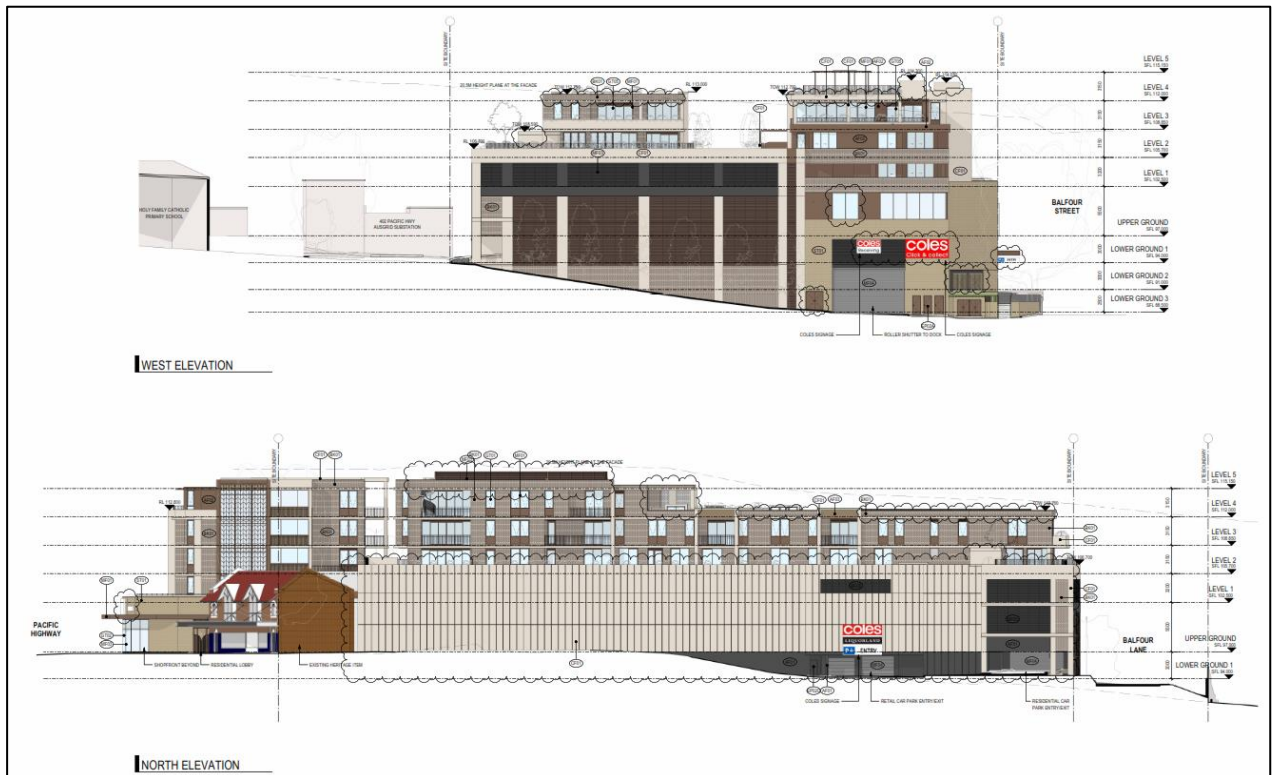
Proposed West and North Elevations (Source: Rothelowman)
